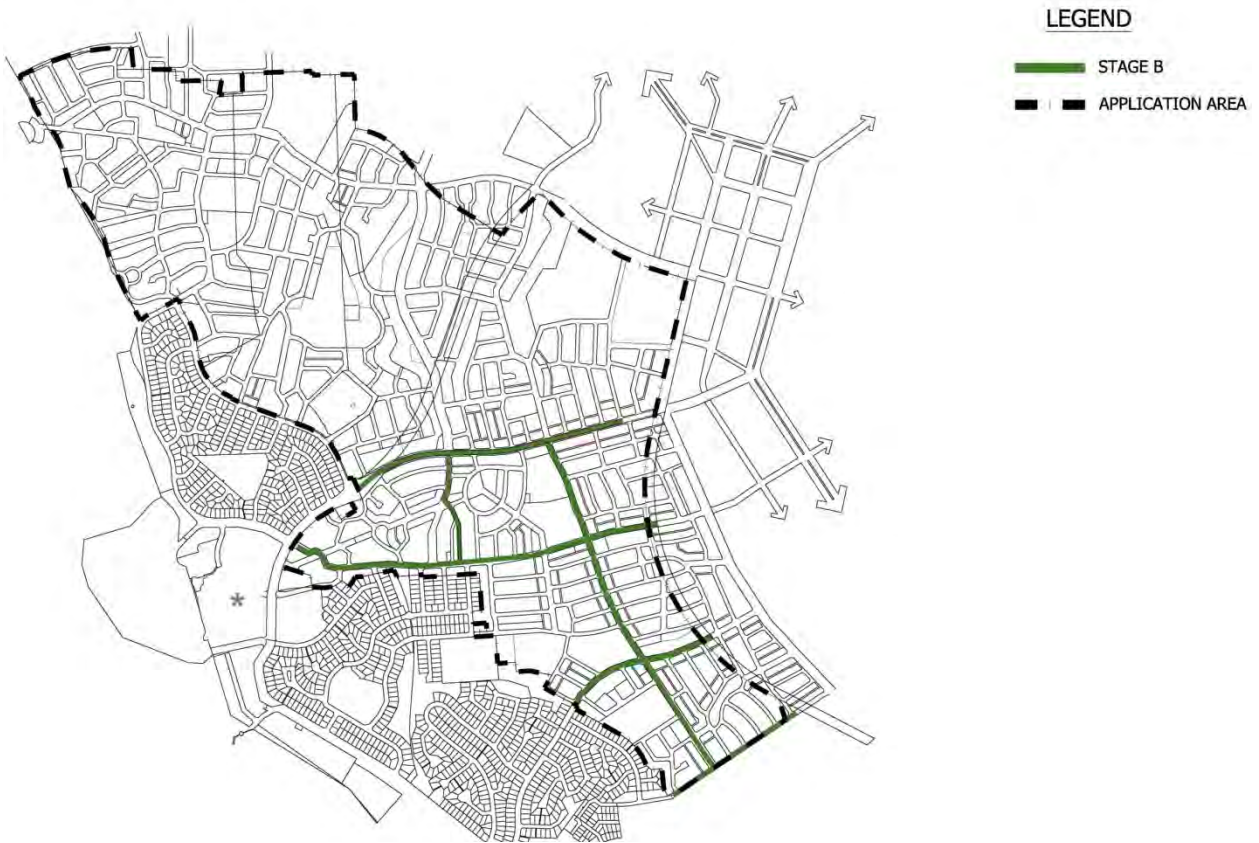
STAGE B MAJOR ROAD CONSTRUCTION [SOURCE: SKM]
